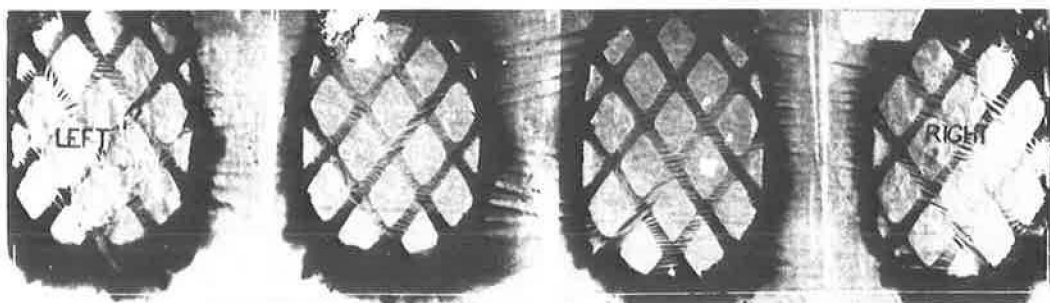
Tire contact areas of 59-ton pavement breaker-roller.
